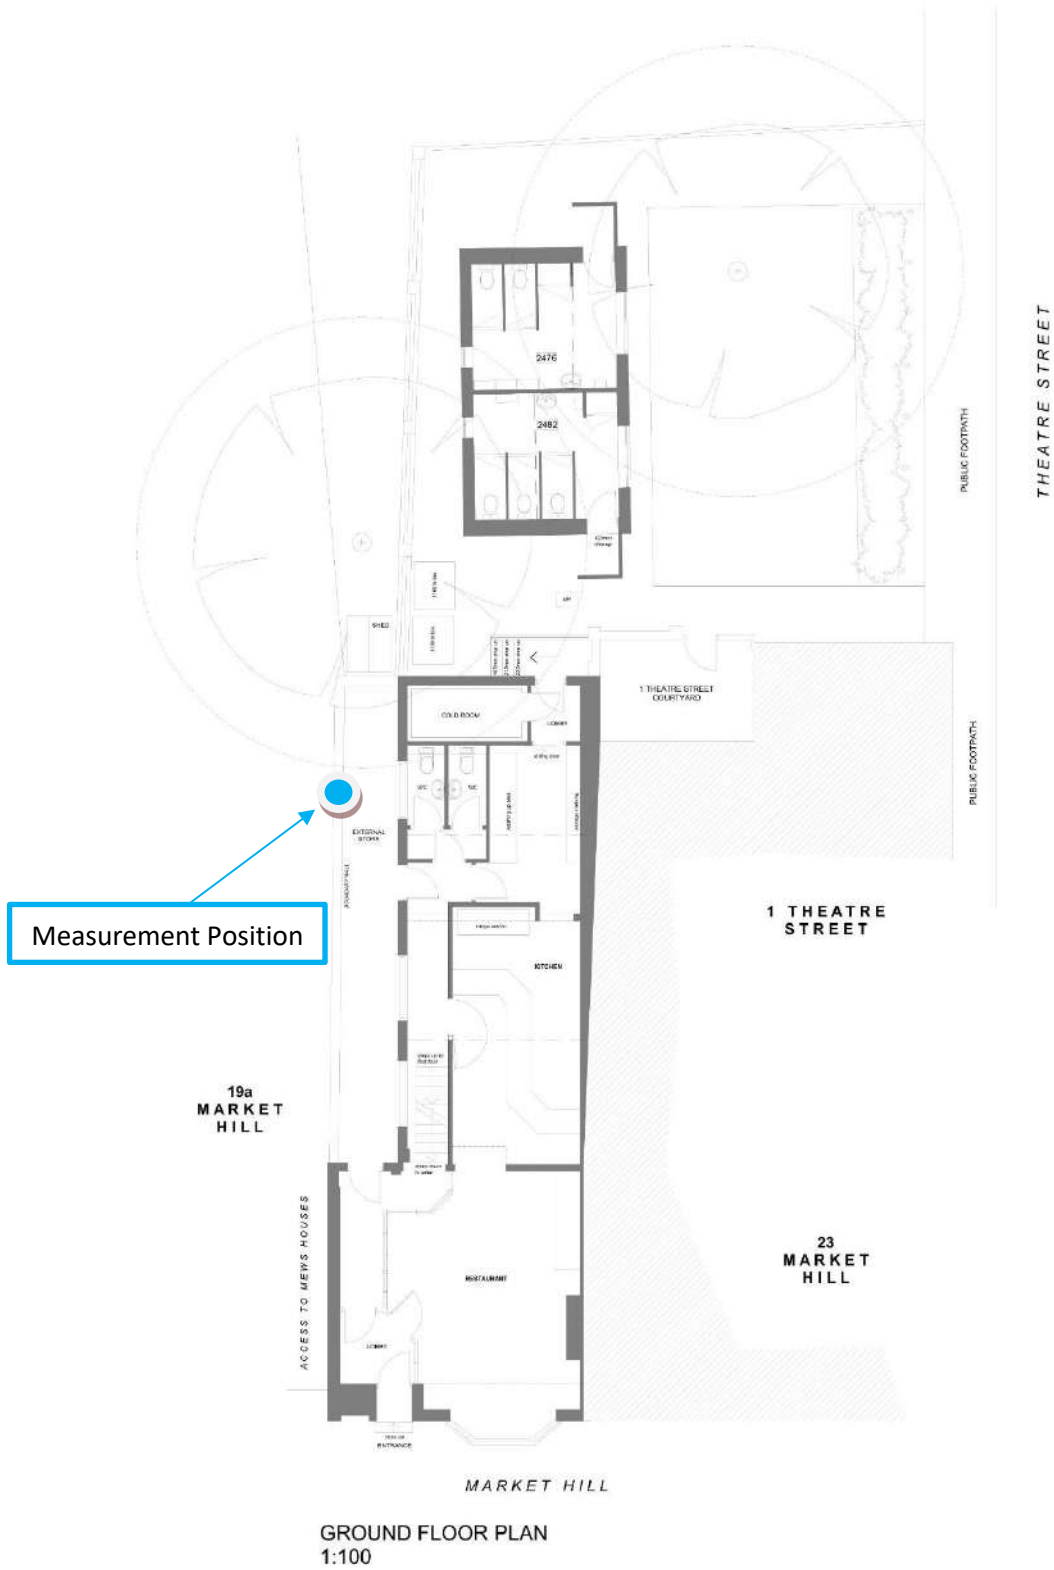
Location Plan, with Measurement Positions highlighted (4.5m above ground level).
